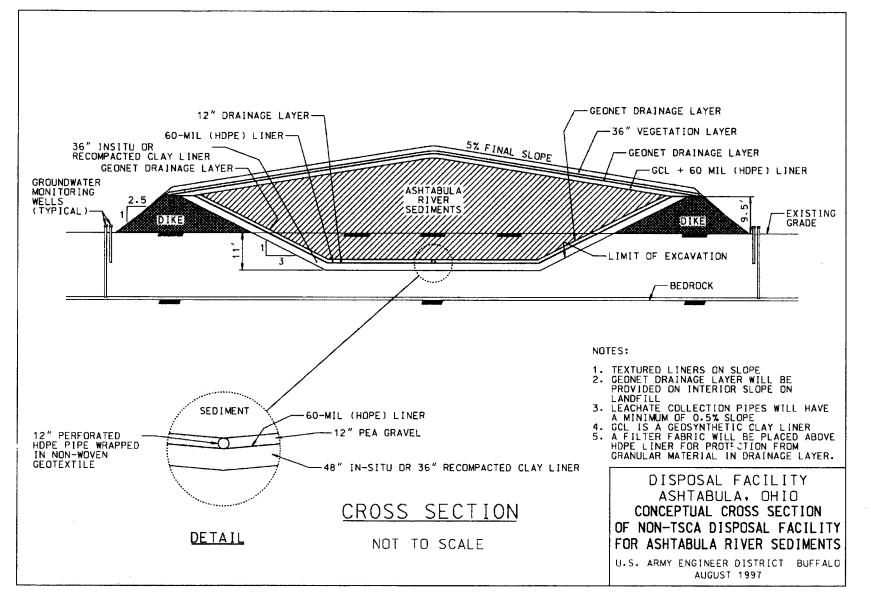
Conceptual Cross-Section of Non-TSCA Landfill Disposal Facility.
